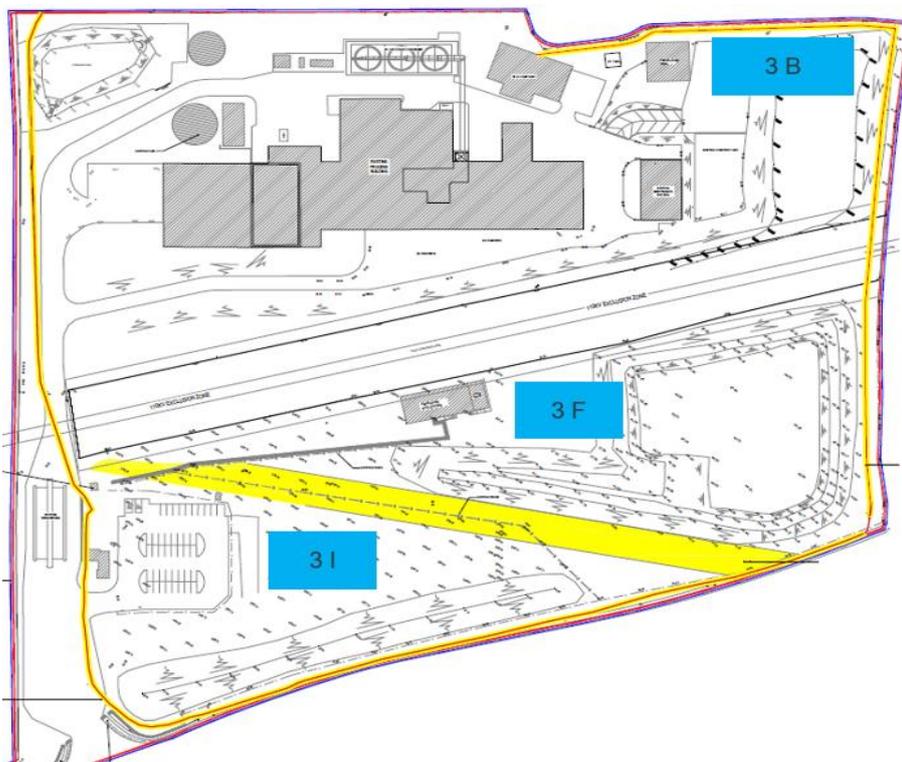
Three alternative locations considered for Bottom Ash Storage Building
